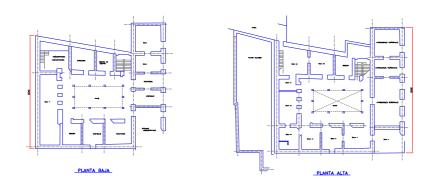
Architectonic plan, Felipe Santiago Gutiérrez Museum
